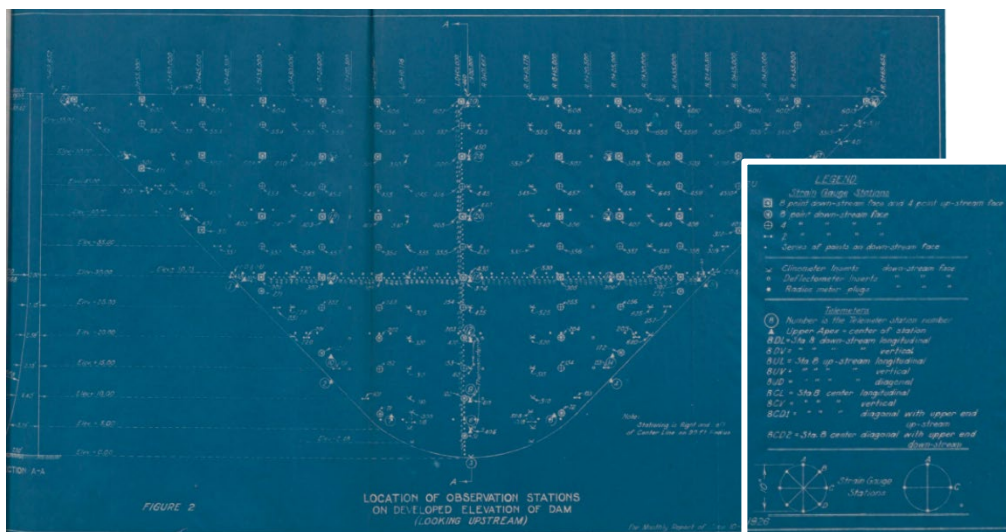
Original sketch of instrumentation plan taken from [5]; dam cross-section is shown to the left.
